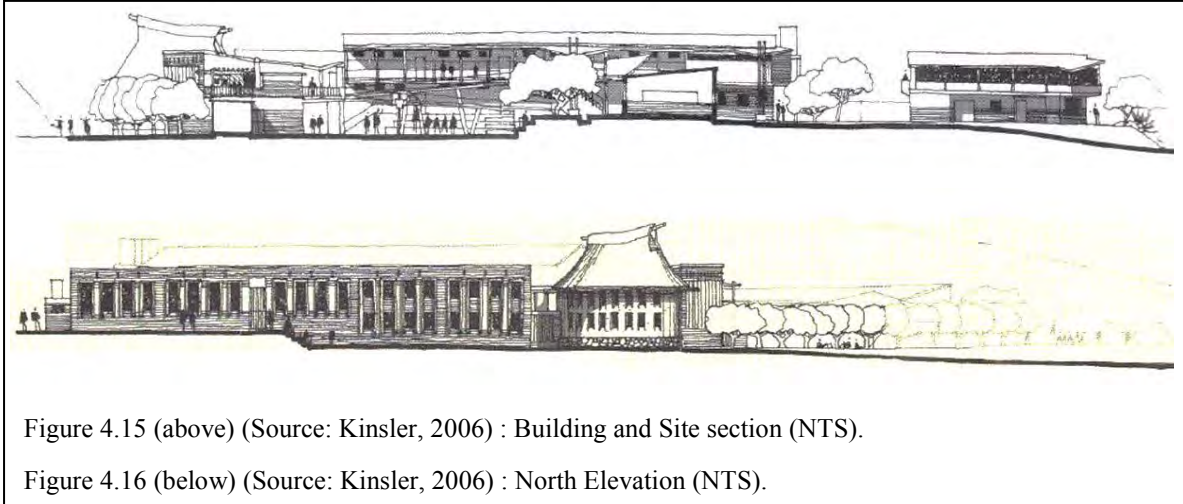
(above) (Source: Kinsler, 2006) : Building and Site section (NTS).
